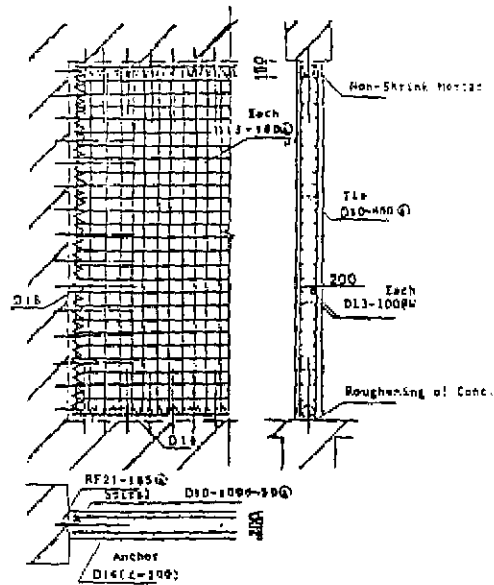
REBARS ARRANGEMENT OF IN-FILLED SHEAR WALL.
